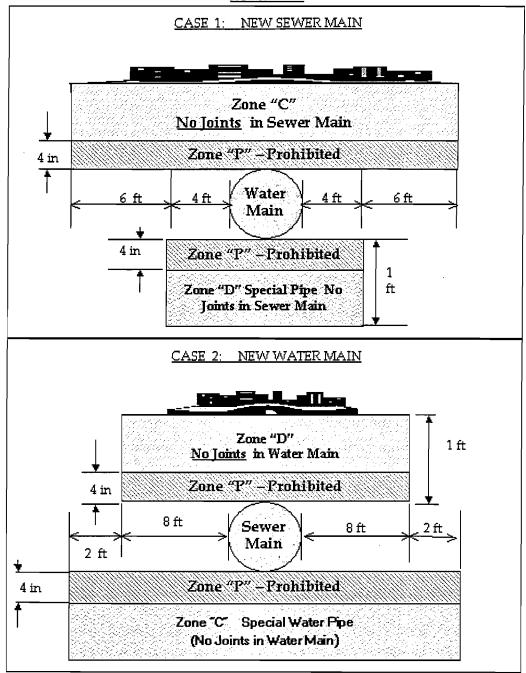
PARALLEL CONSTRUCTION Not To Scale
